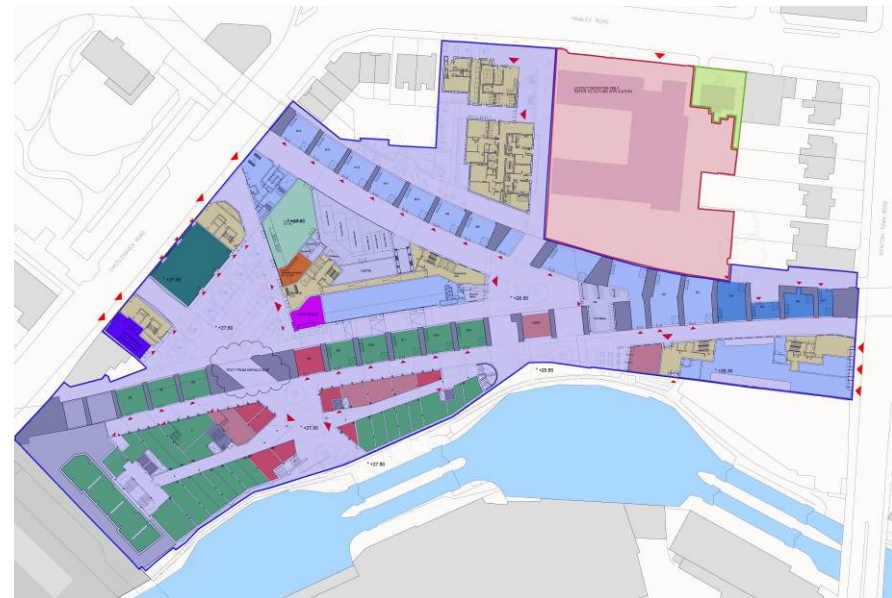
Area in blue: detailed planning application. Area in pink: outline planning application. Area in green: planning application and detailed Listed Building Consent.
